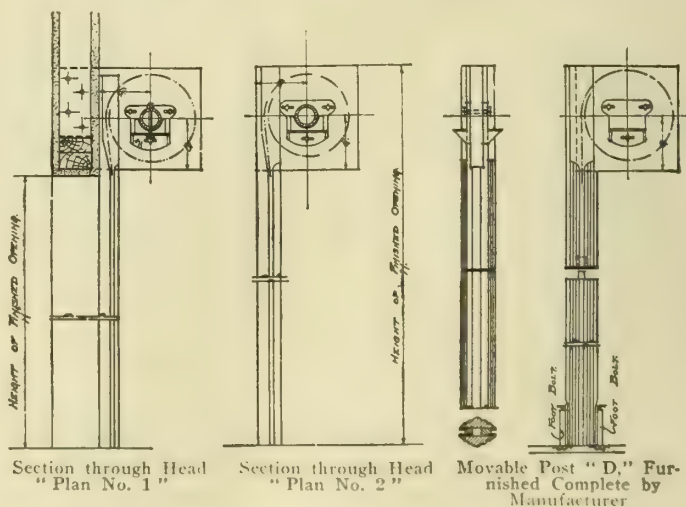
"NE PLUS ULTRA" BALL-BEARING FIXTURE
